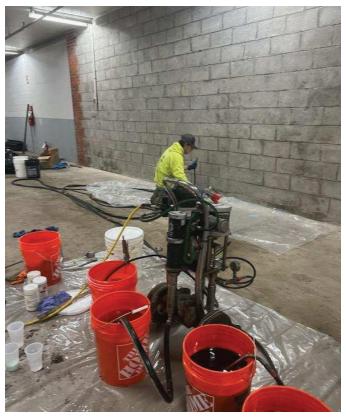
Injection of the chemical grout through the wall (Picture courtesy of Jeans Waterproofing)
